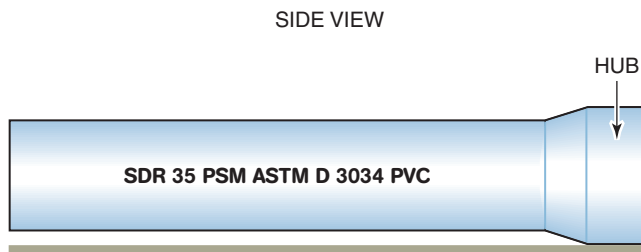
SDR PVC pipe used for sewer installations.
